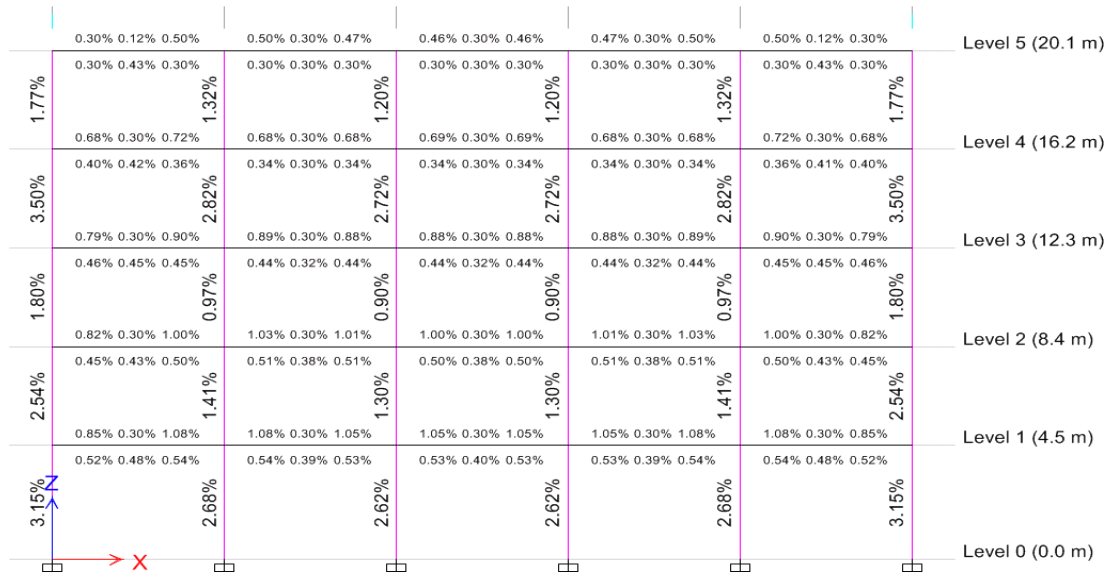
Required longitudinal reinforcement for building ID 2445
